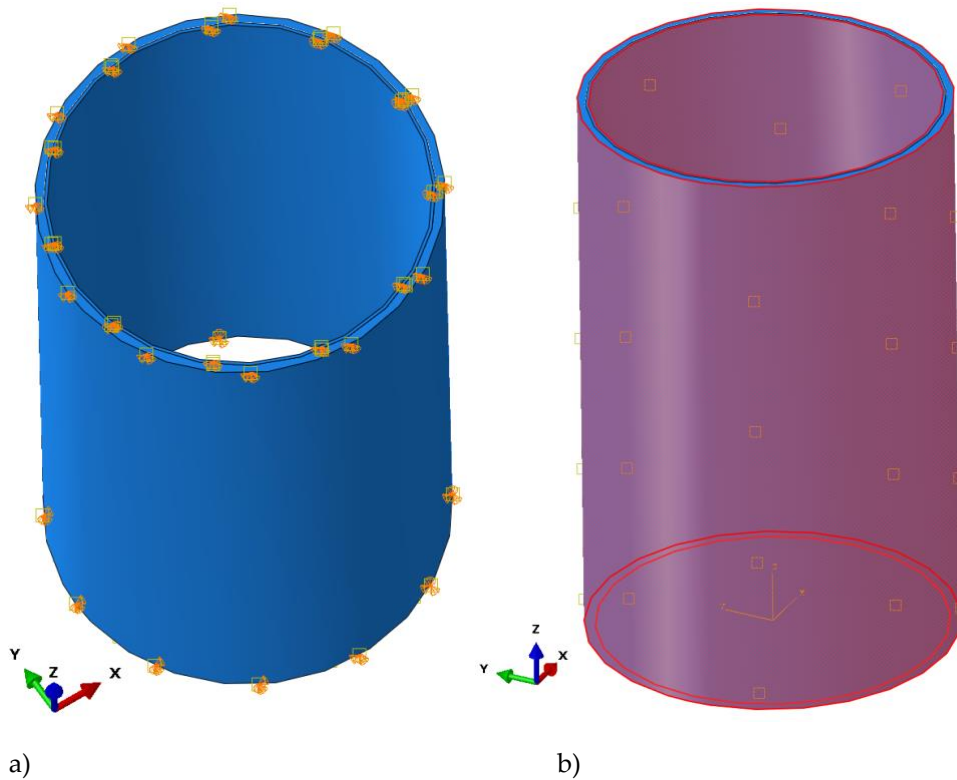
Illustration of modelled containment wall with outer and inner concrete cylinder and steel liner between. Boundary conditions shown in (a) and surface of load application shown in (b).
